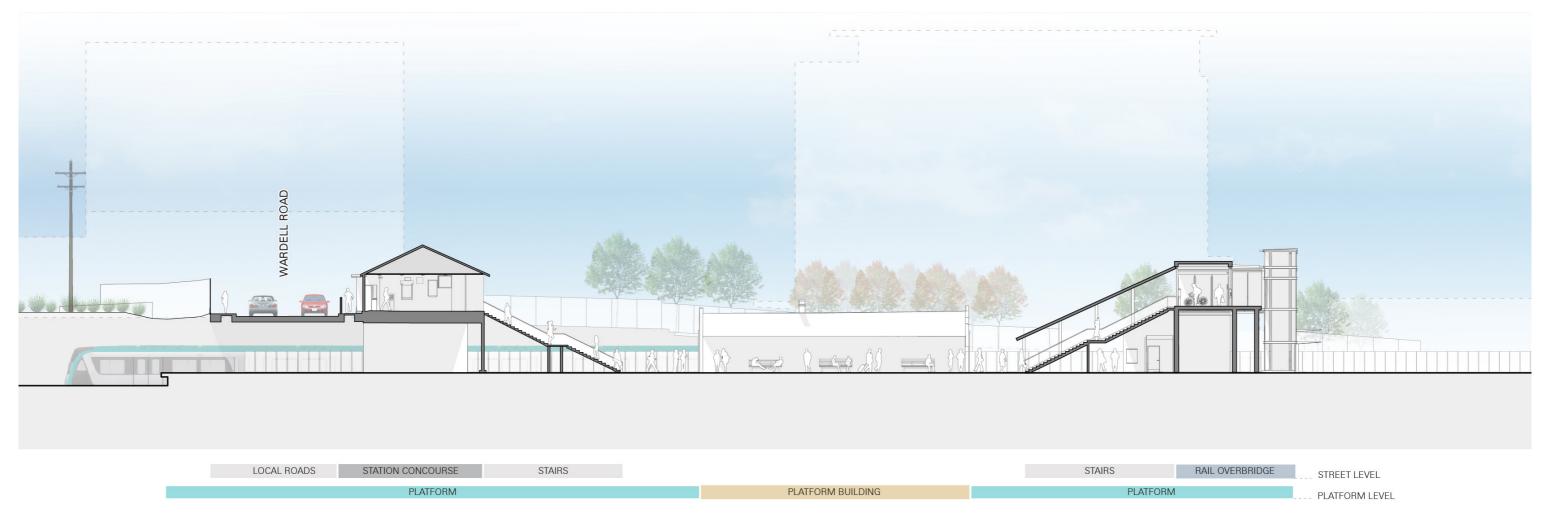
Section B: through Wardell Road and concourse buildings along the platform
